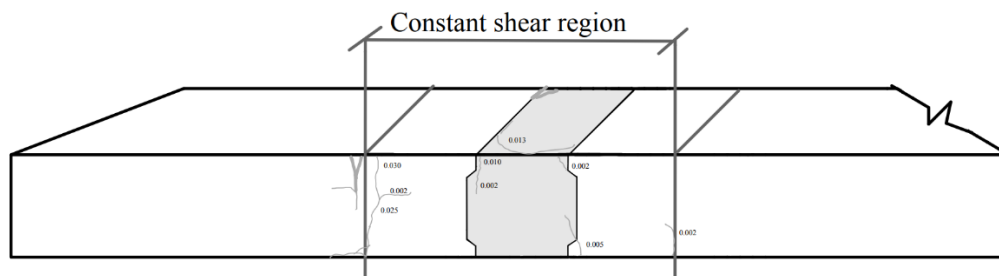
Crack Propagation for Non-Proprietary Long-Term Specimen at Failure
